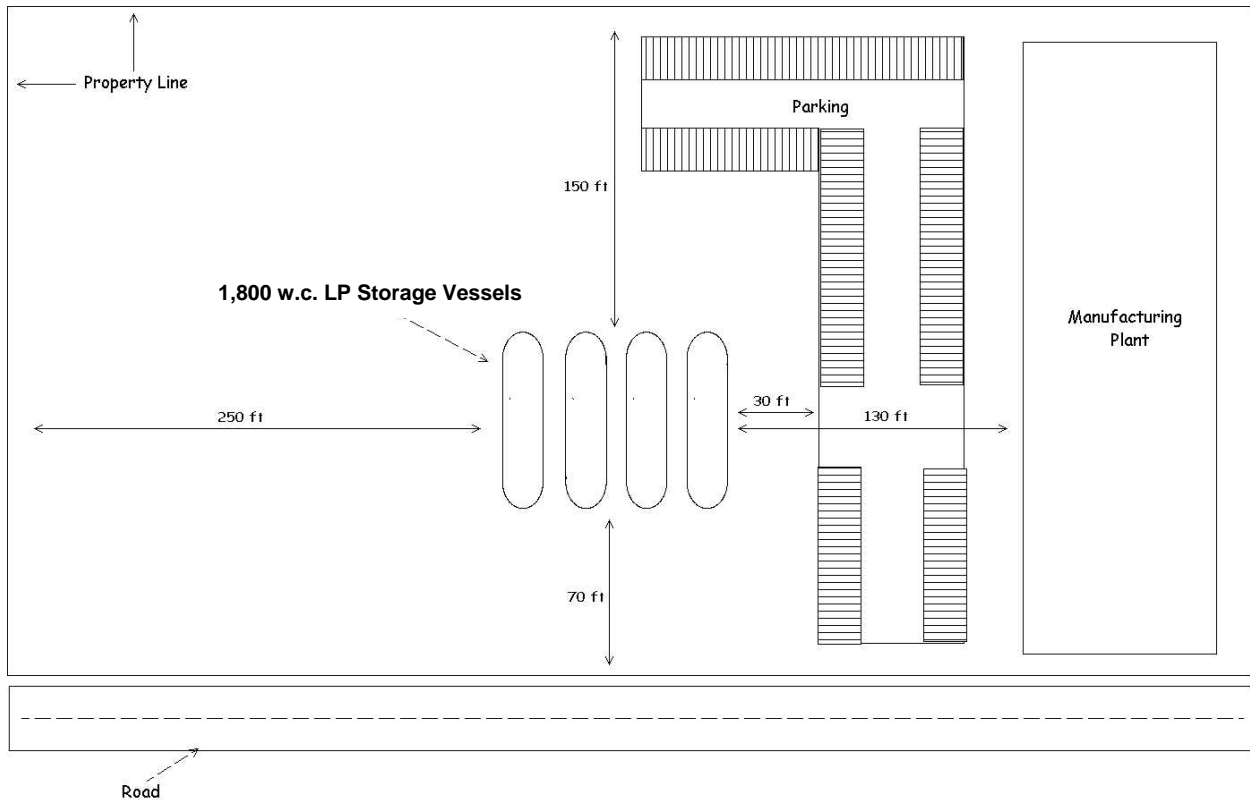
Schematic plan view of a LP-Gas facility used in Example 1
